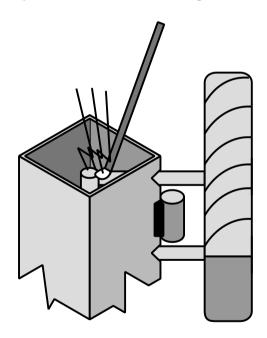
welding re-bar to frames for wooden load pads.
